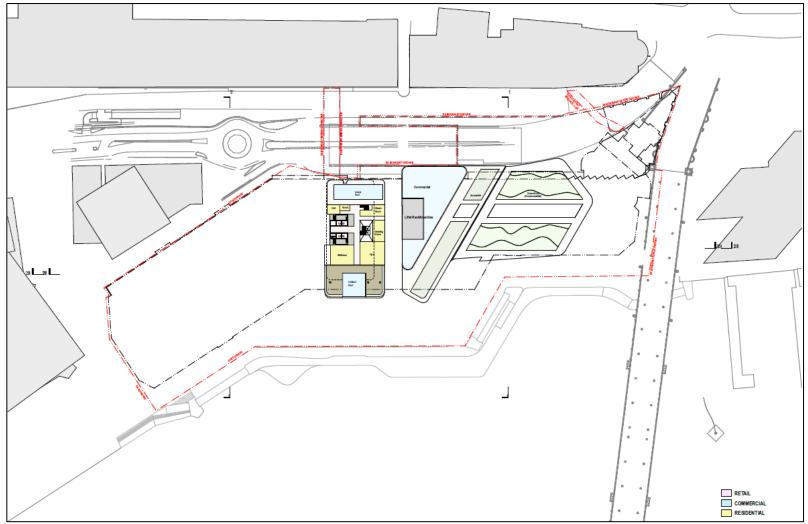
Indicative Plan Only – Level 5 Retail, Residential & Podium Roof Plan (Source: fjmt, 28/09/2020)
